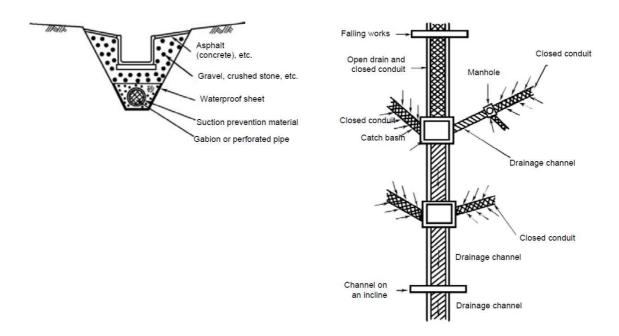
Open drains and closed conduits Source :(Erosion and Sediment Control Research Group, 2007)
